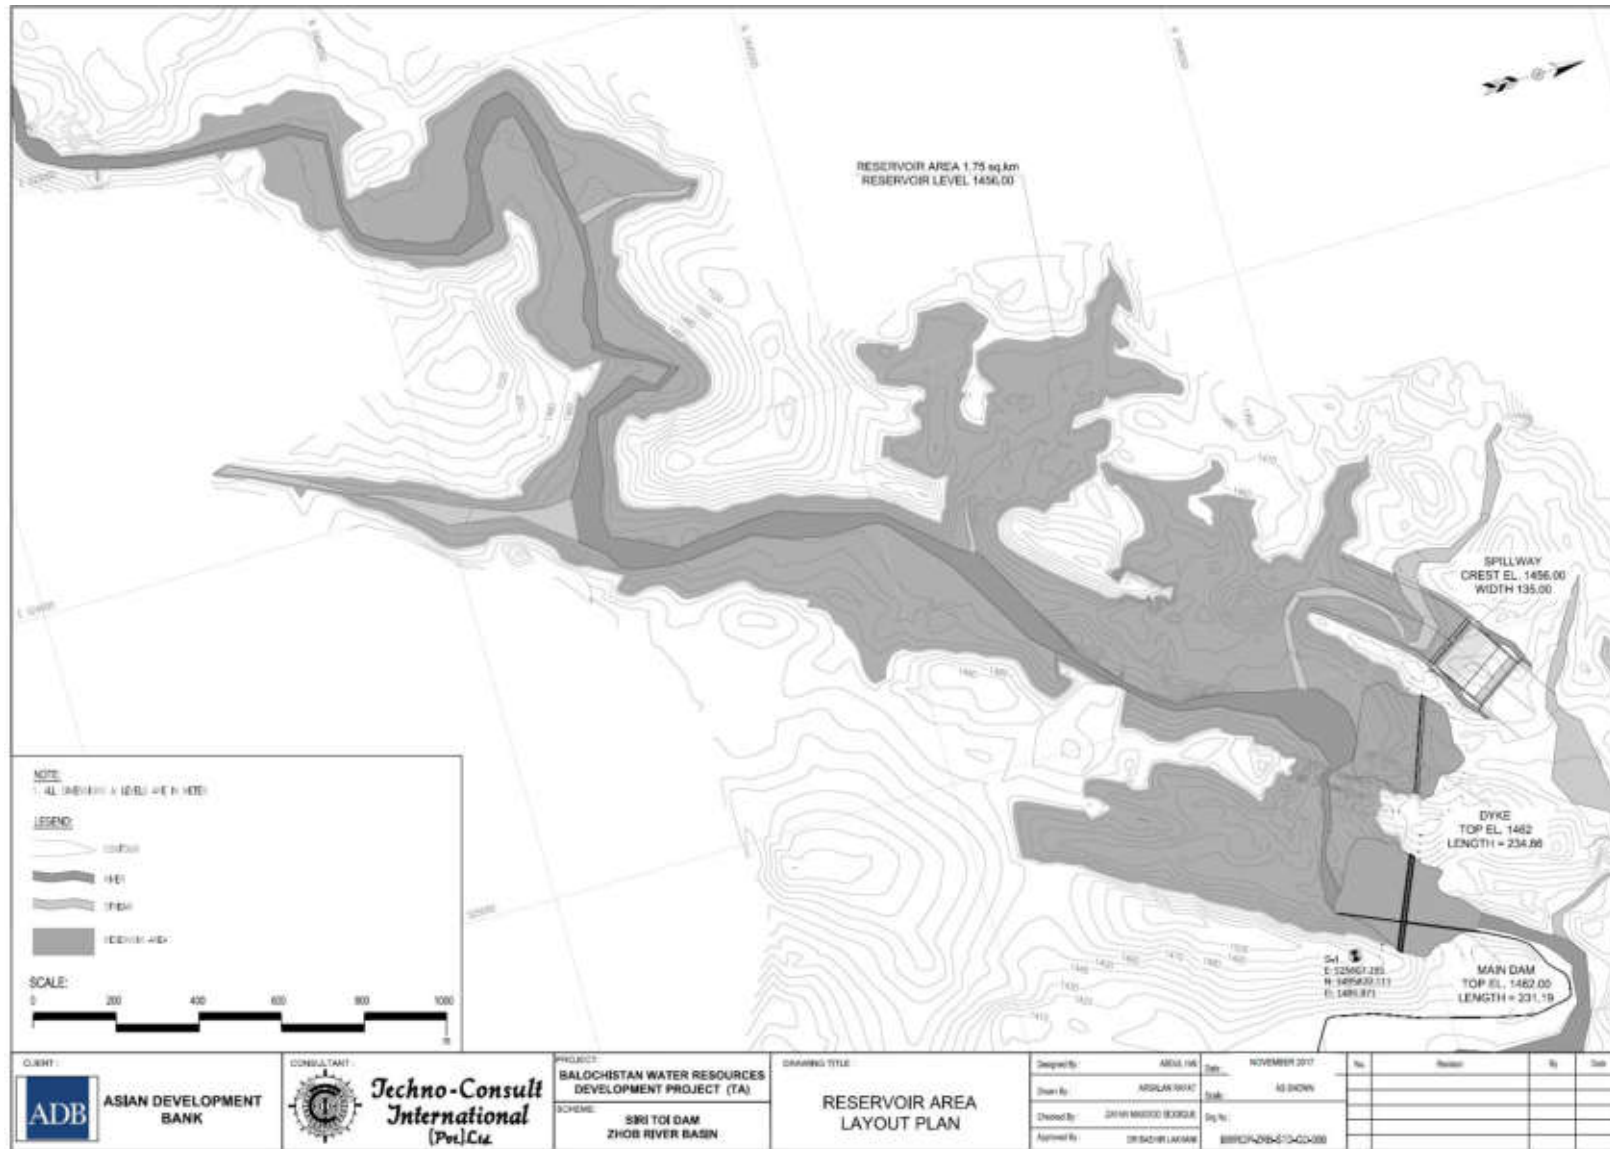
Layout Plan Model of Proposed Dam(Detail Design)
